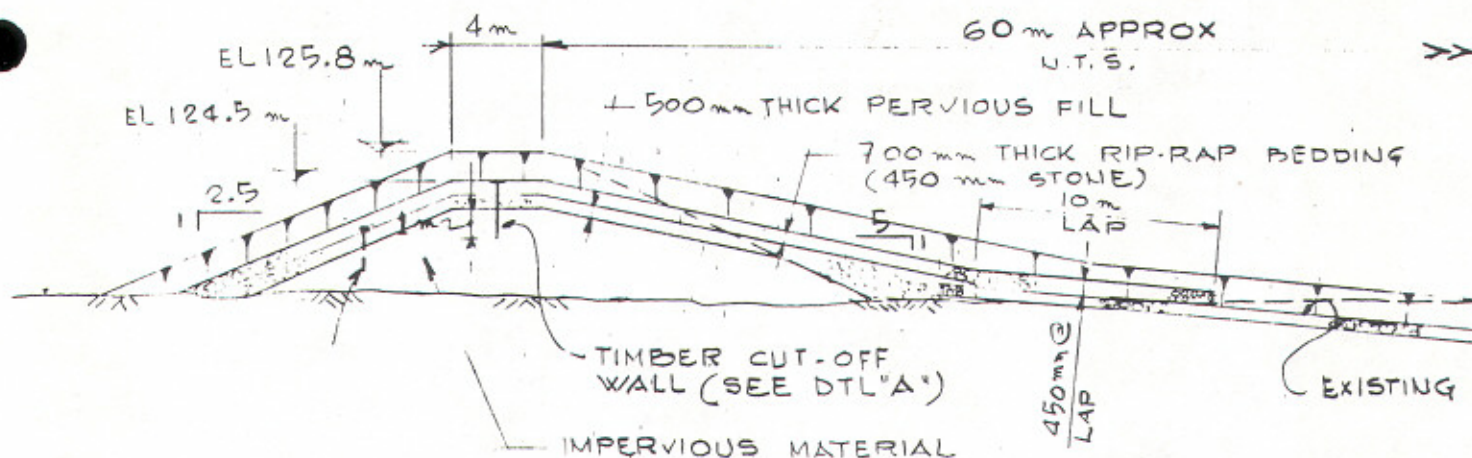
MOUNT PLEASANT SPILLWAY
